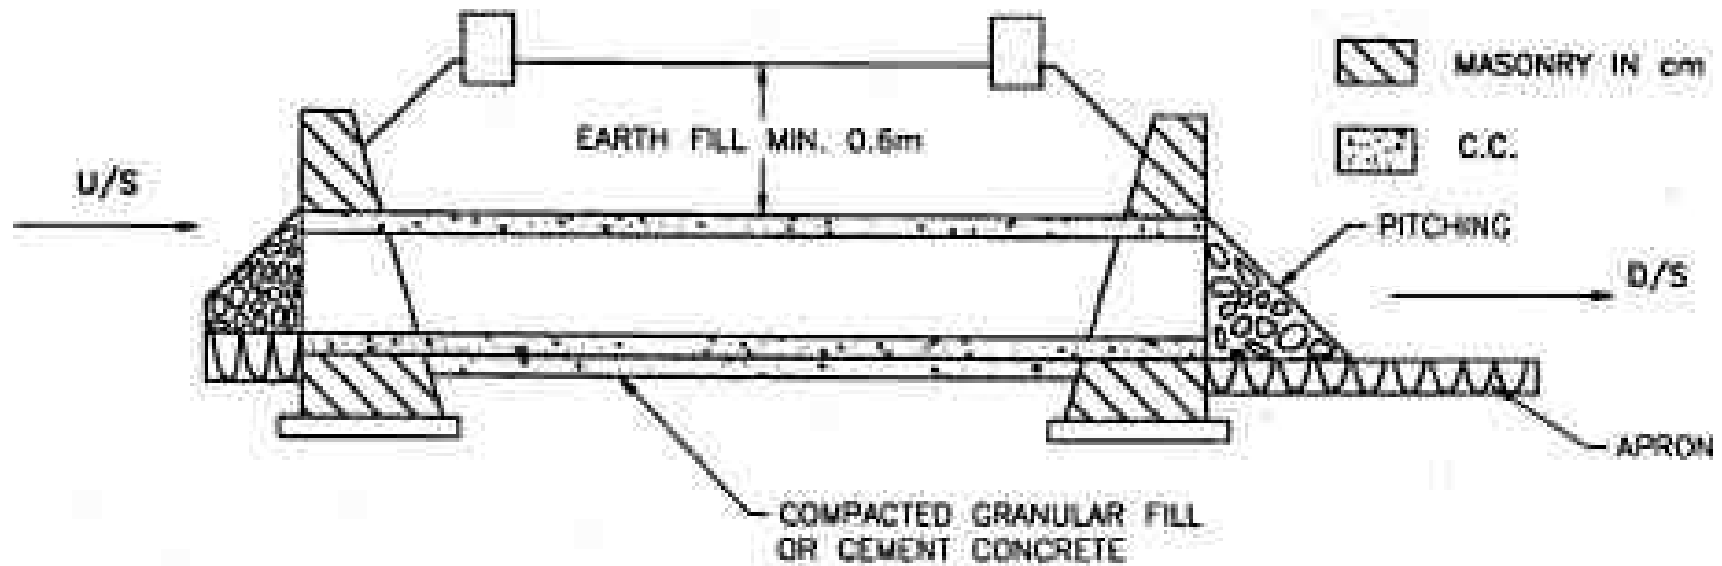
CULVERT IN EMBANKMENT - PIPE CULVERT
